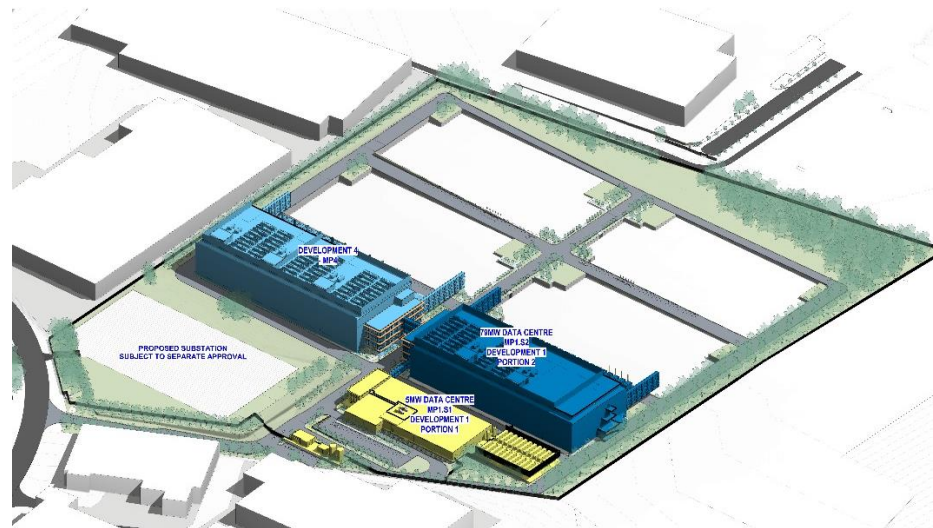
Masterplan Massing – Construction Phasing – Stage 2
